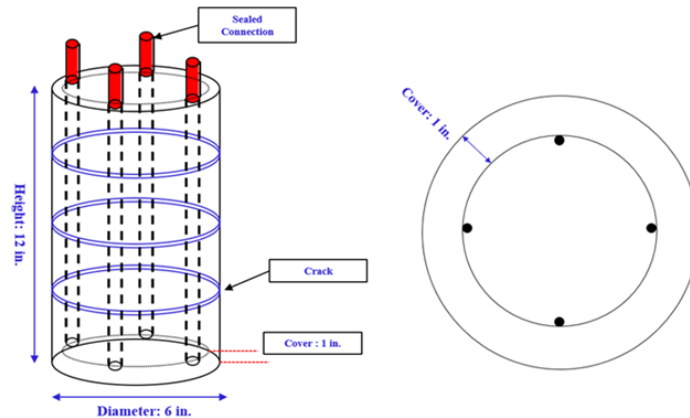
Steel Bars Embedded in a Concrete Cylinder with a Crack.
